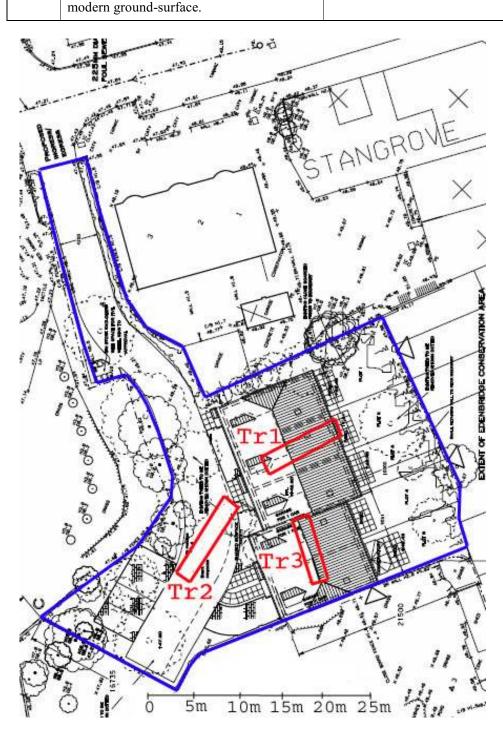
Plan of the three evaluation trenches, superimposed over the proposed development plan.
